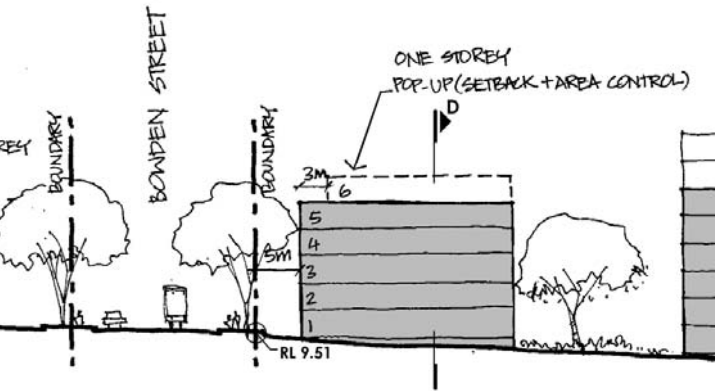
NANCARROW AVENUE NORTH STREET WALL ELEVATION ILLUSTRATING SETBACKS
